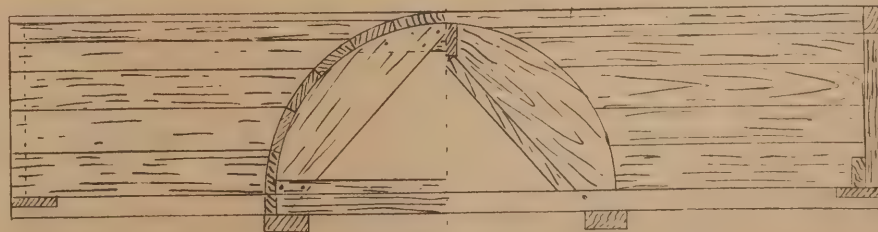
SECTIONAL ELEVATION ON A-B OF GROIN CENTRE.
